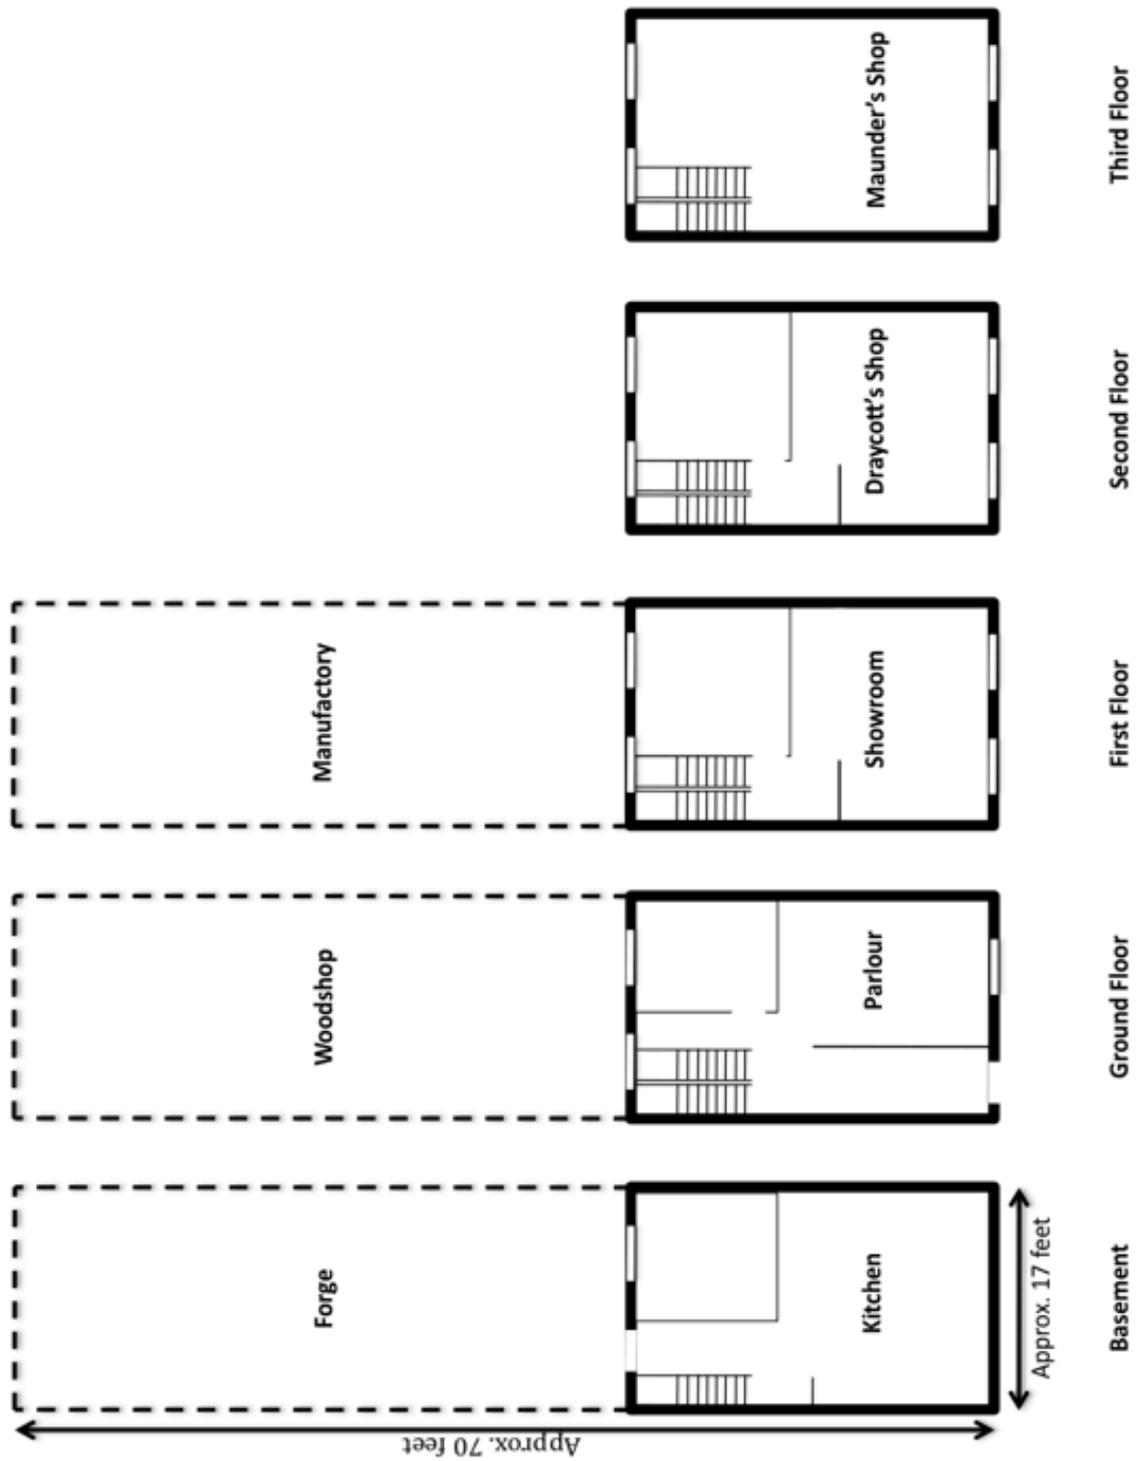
Proposed layout of 100 Wardour Street in April 1820.
